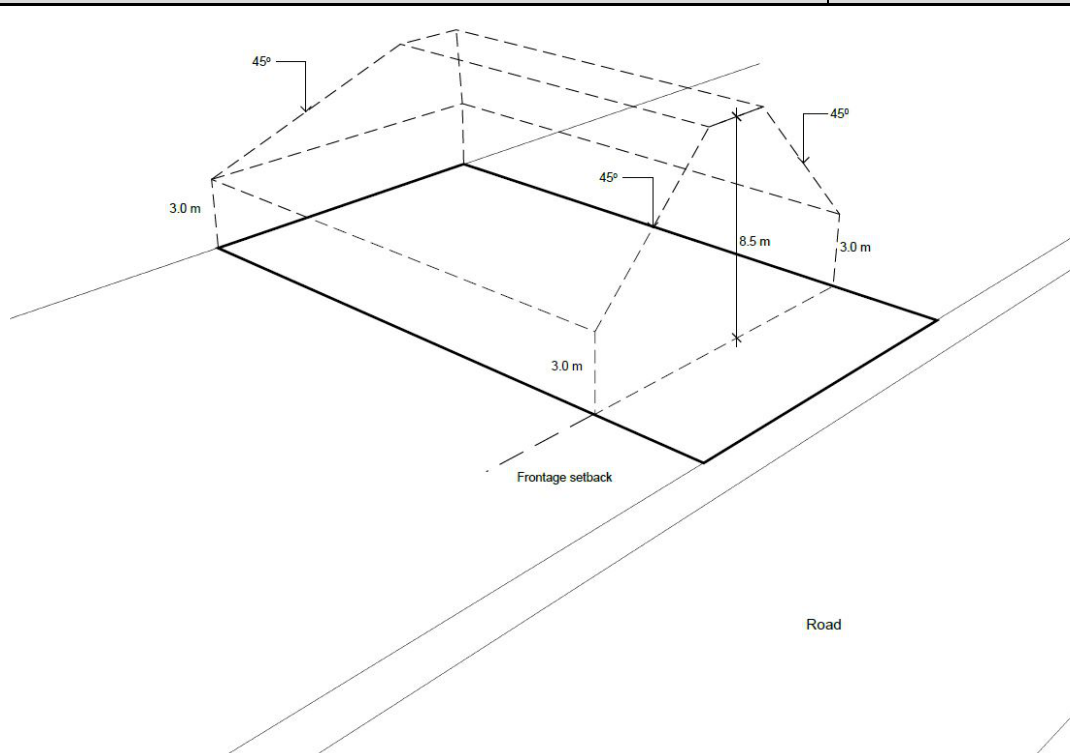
Building envelope as required by clause 10.4.2 A3(a)
